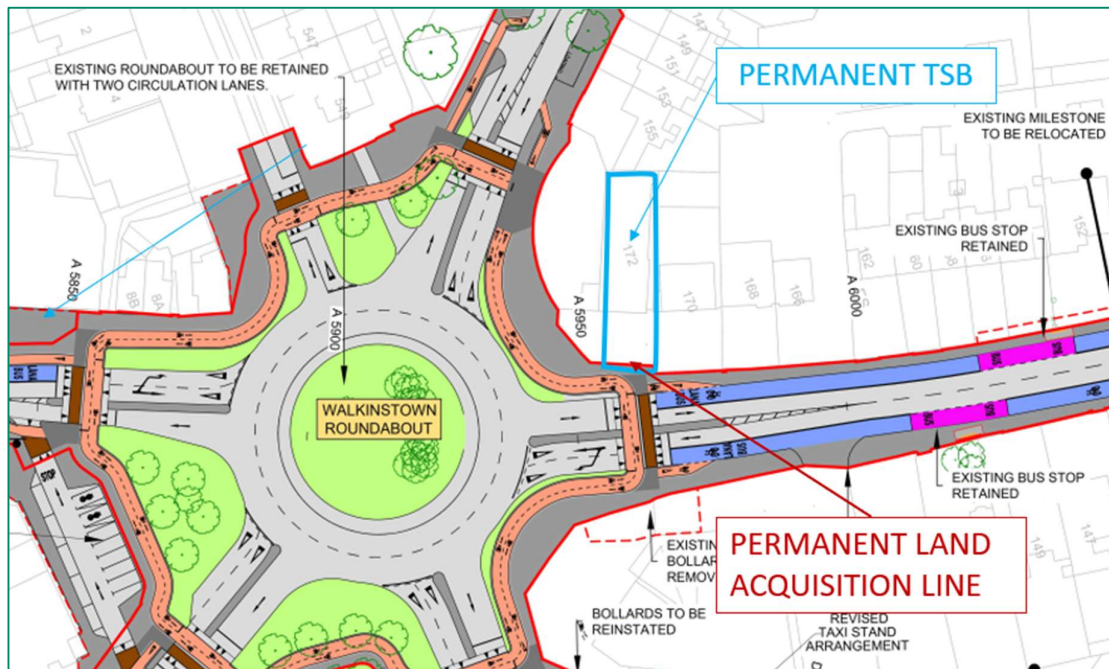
General Arrangement of Proposed Scheme adjacent to Permanent TSB at 172 Walkinstown Road (Sheet 19)
